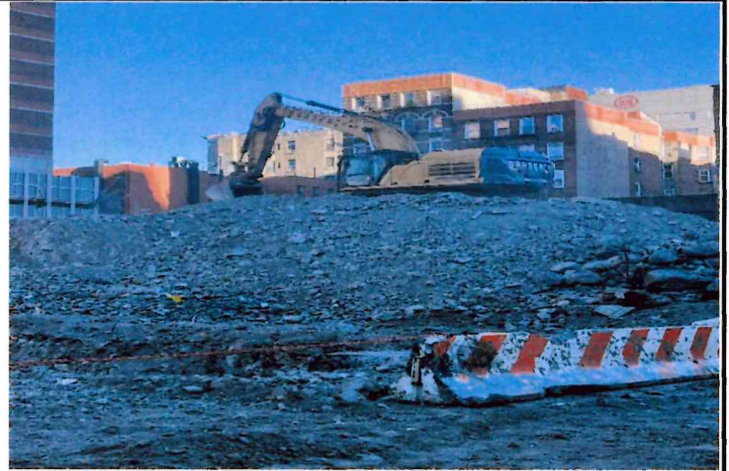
Crushed concrete Stockpile looking east, 11/13/24
